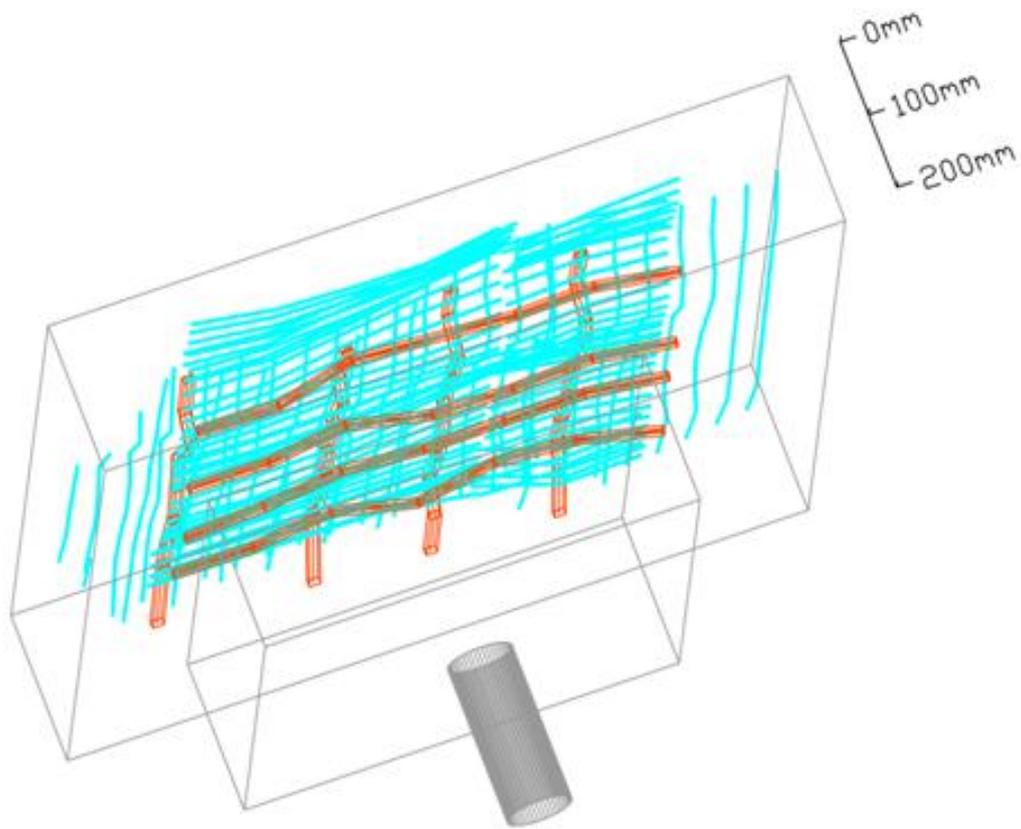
3D view from upward perspective view, showing PT duct layout and reinforcement detail
